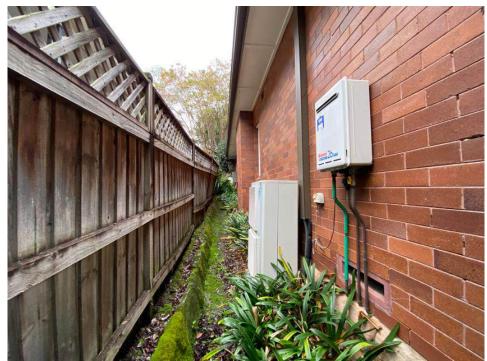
5 Nelson Road – The external building structures appeared to be in good condition
